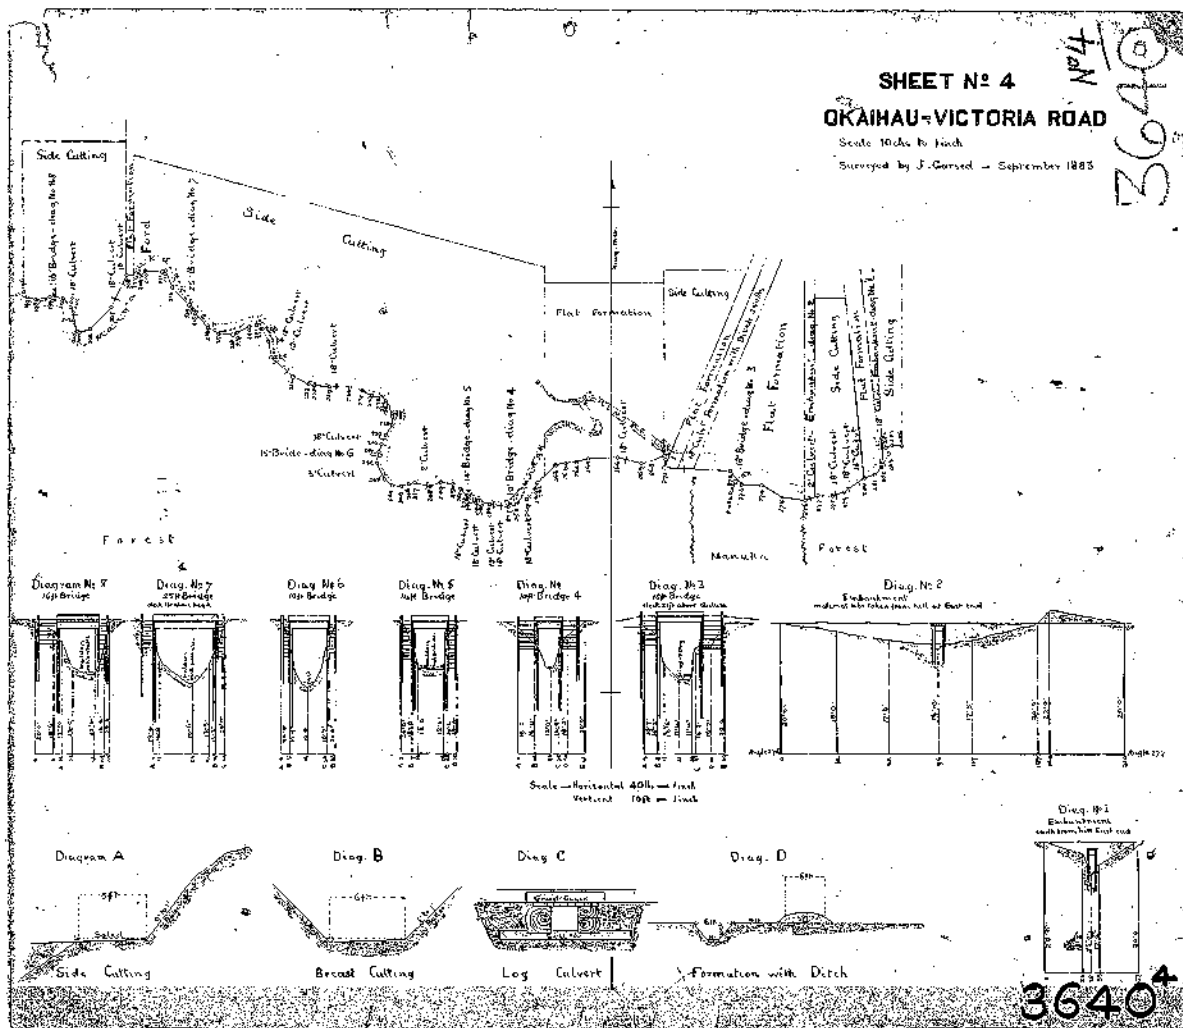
SO 3640/4 Okaihau-Victoria Valley Road. J. Garsed, 1883. This plan shows exemplary elevations road formation and structures which do not appear to have been built before 1900.
